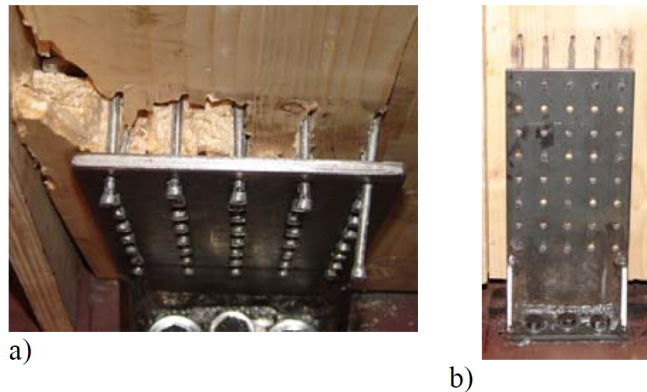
Timber rivet failure in brackets a) showing undesired failure, and b) showing the desired rivet yielding [Popovski et al. \[2010\]](#)
